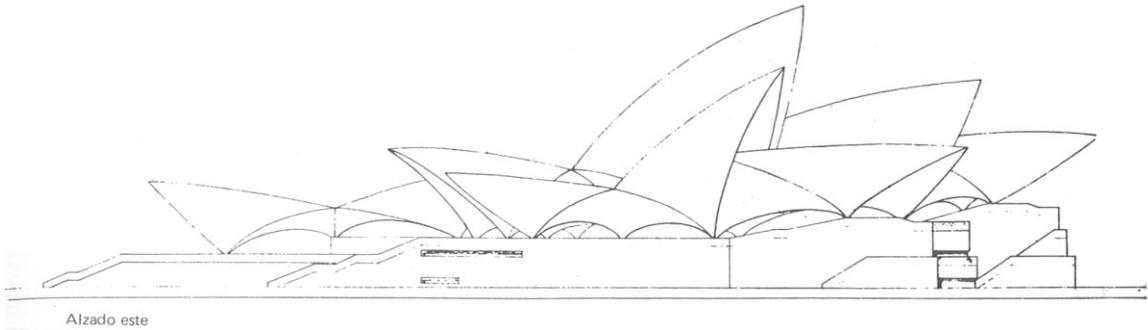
Jørn Utzon - Definitive Elevation, Sydeney Opera House
